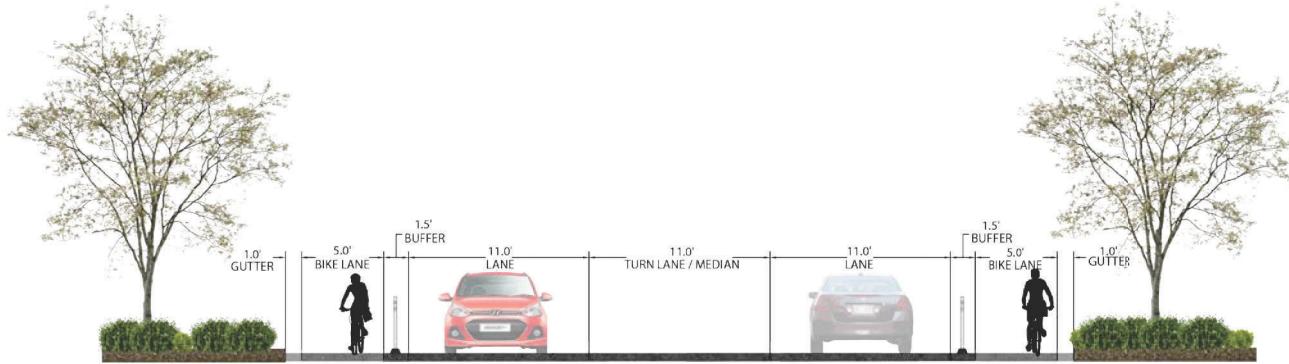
East Jordan Canal Trail typical sections of protected bike lanes on South Union Ave from Creekview Apartments to 1020 E.
